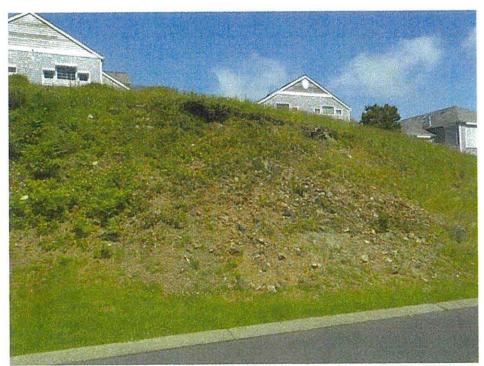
View of the basalt exposed in a road cut along the north side of Sahhali Drive due north of the site (2018).
